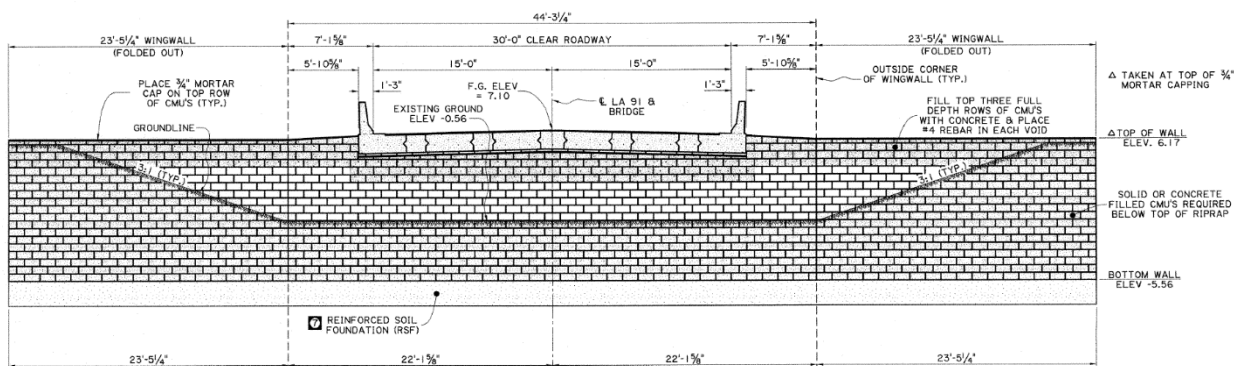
Diagram. GRS abutment elevation view of Unnamed Creek Bridge.
